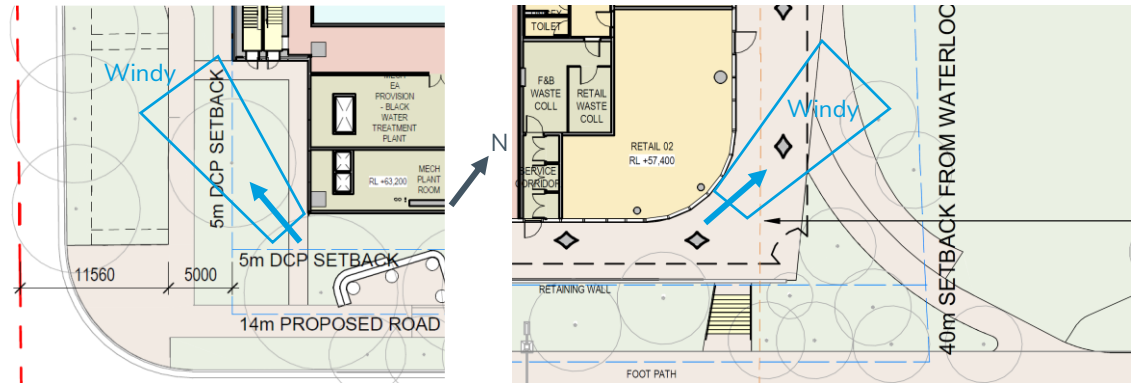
Ground floor plan of the south(L) and east (R) corners for winds from the south-east
